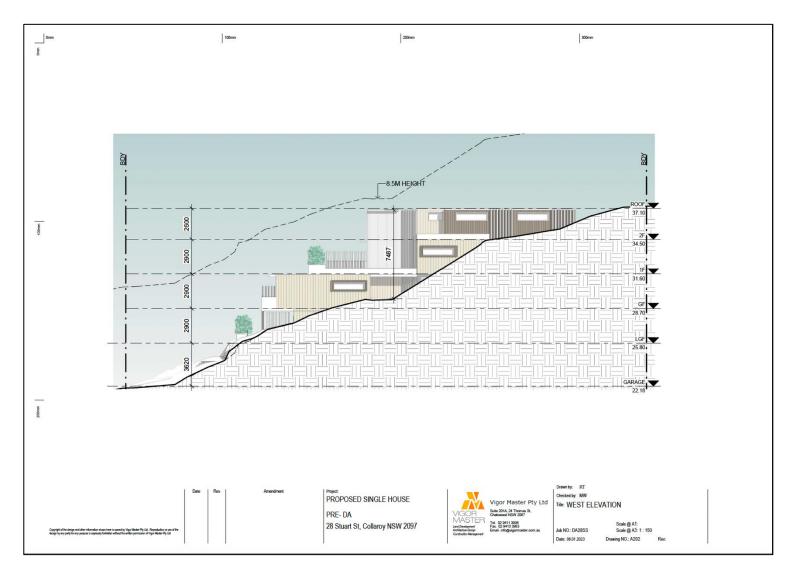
ILLUSTRATES PROPOSED WEST ELEVATION
